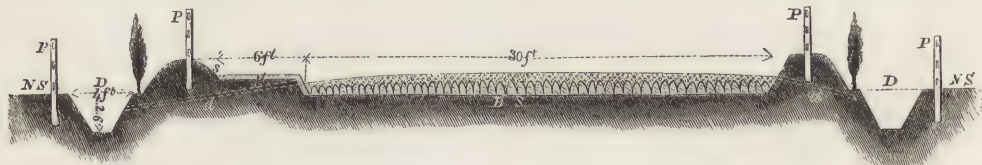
CROSS SECTION OF A NEW ROAD WITH A PAVED FOUNDATION. (Telford.)
